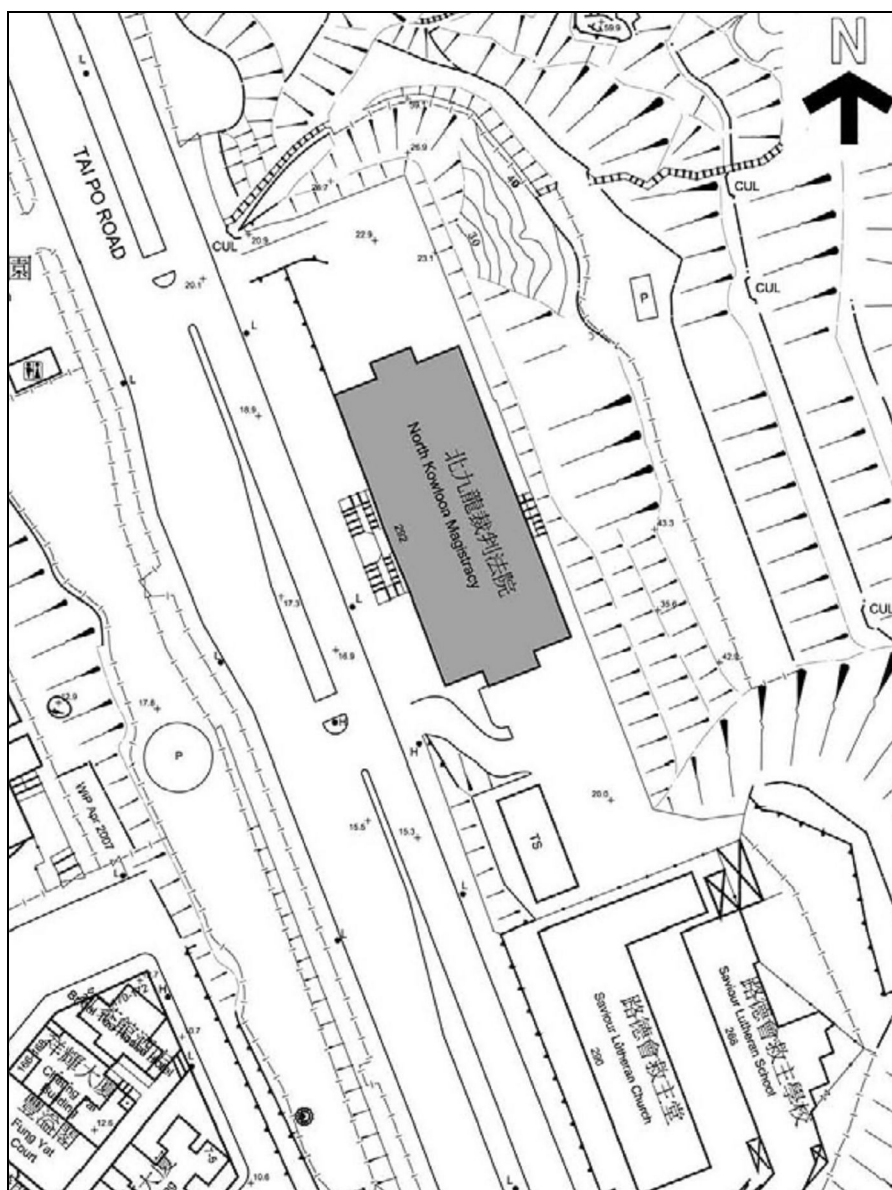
Site Location Plan (Source: NKM Resource Kit, DEVB)
